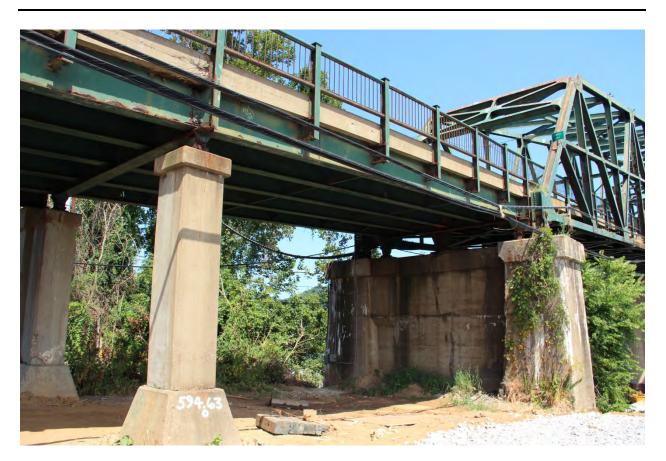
SOUTHEAST ELEVATION OF SOUTHWEST VIADUCT SPAN NO. 5 SHOWING VIADUCT PEDESTAL NO. 4 AND BRIDGE PIER NO. 1, FACING NORTH.
